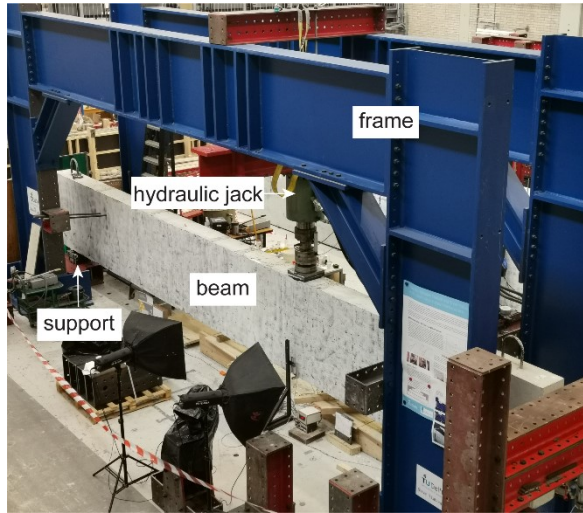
Photo of test setup including frame, support and hydraulic jack.
